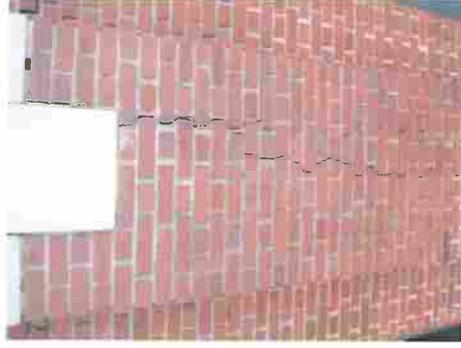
vertical crack in each pylon, caused by rusting vertical I-Beam
